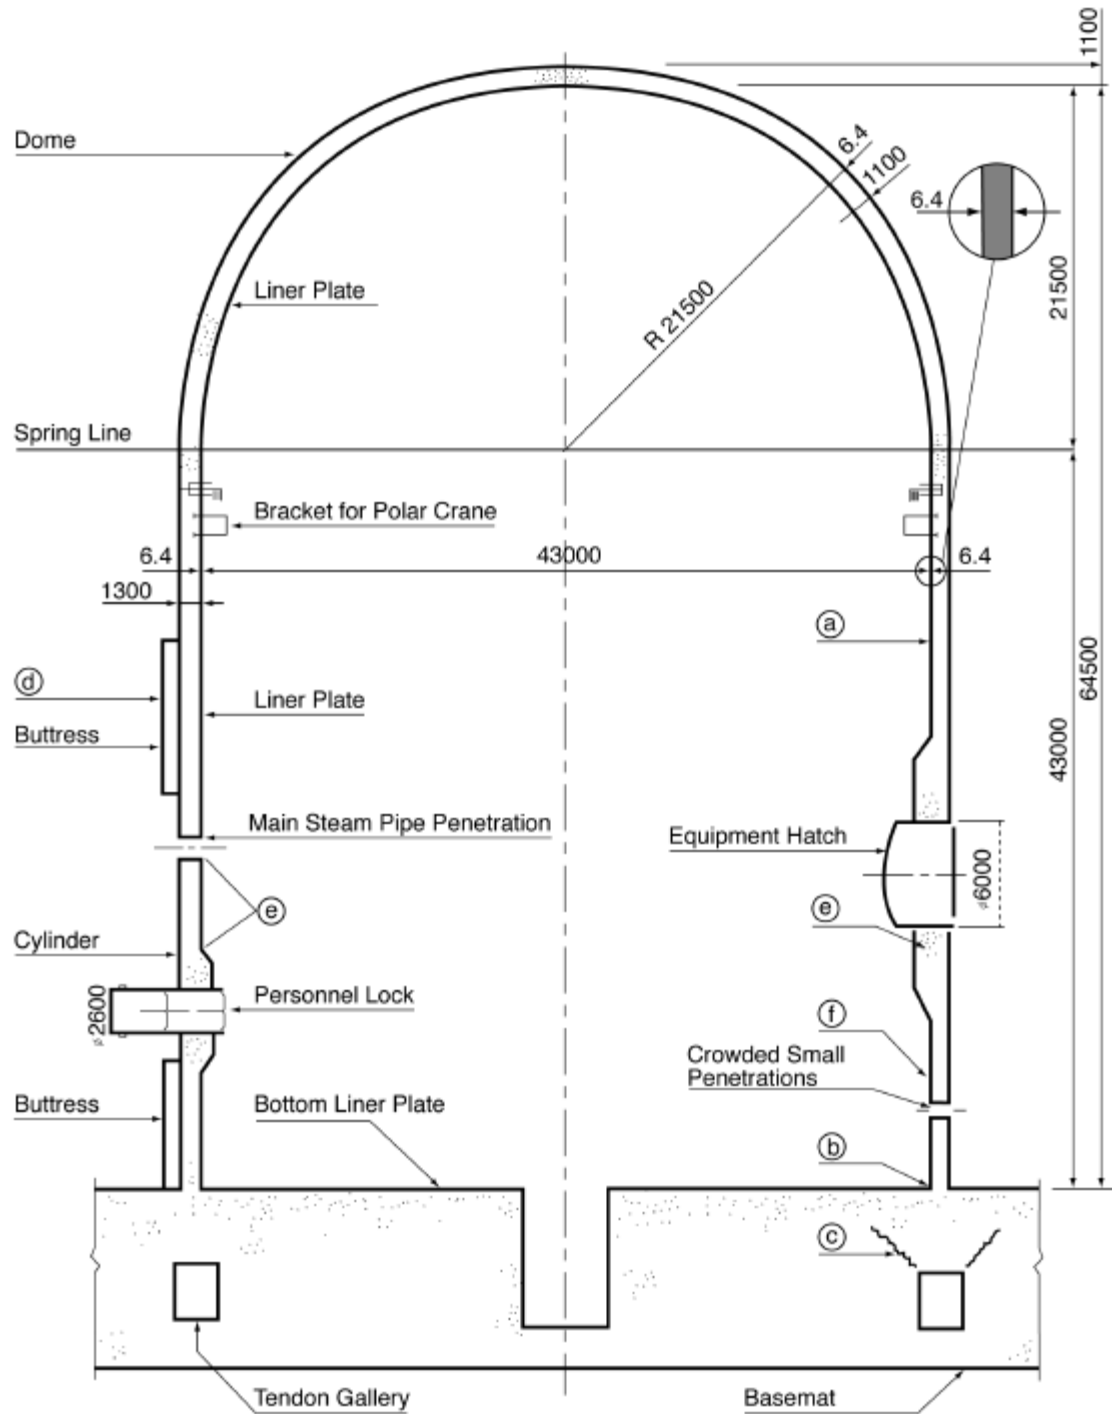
Elevation of PCCV Prototype and Potential Failure Locations
